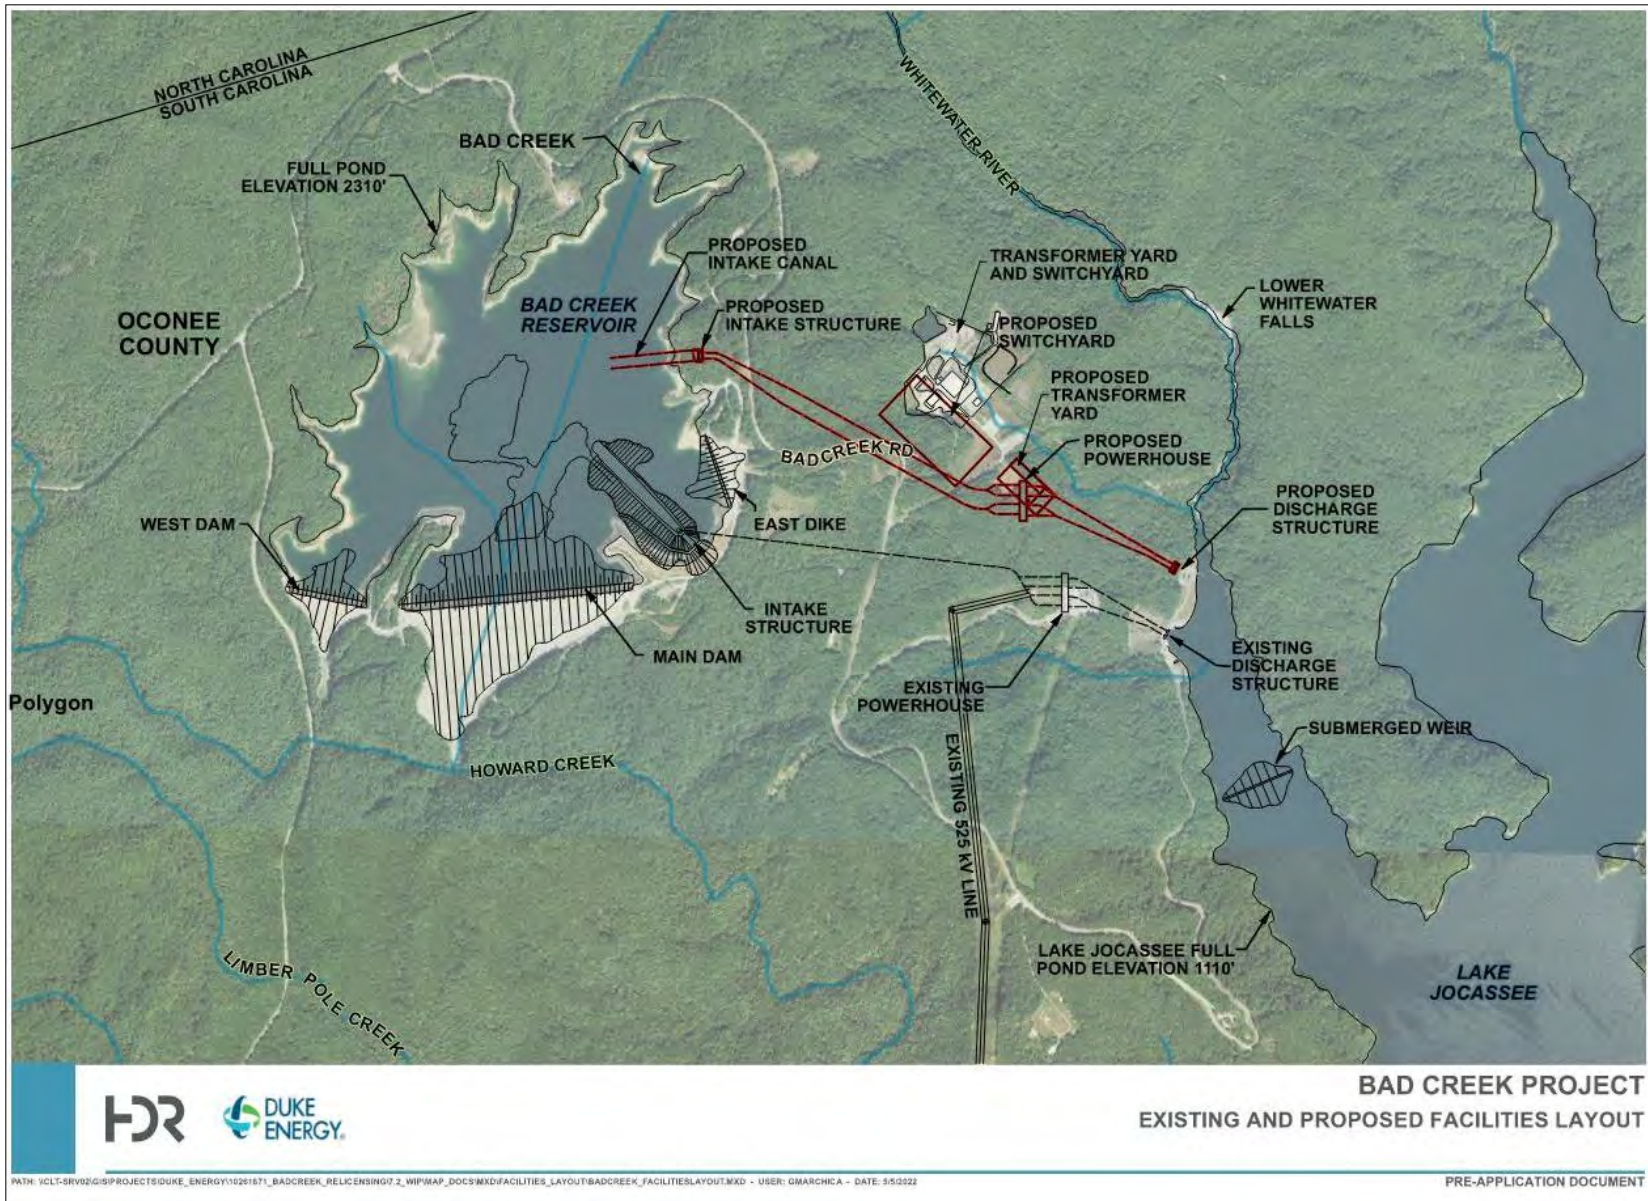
Proposed Bad Creek II Complex Facilities Layout (Major Existing Bad Creek Project Facilities are also Shown)
